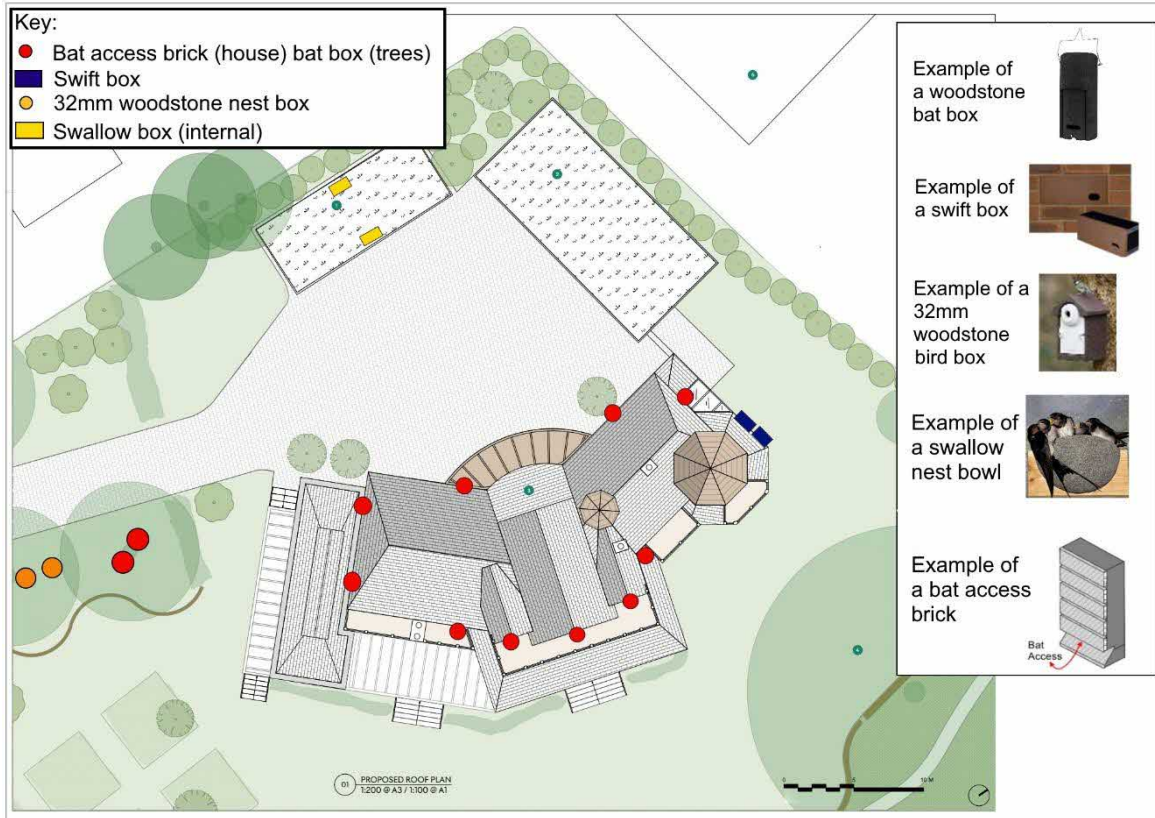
Plan showing the indicative locations of the mitigation, compensation and enhancement measures on the external elevations of Orchard House and the carport (not to scale).
